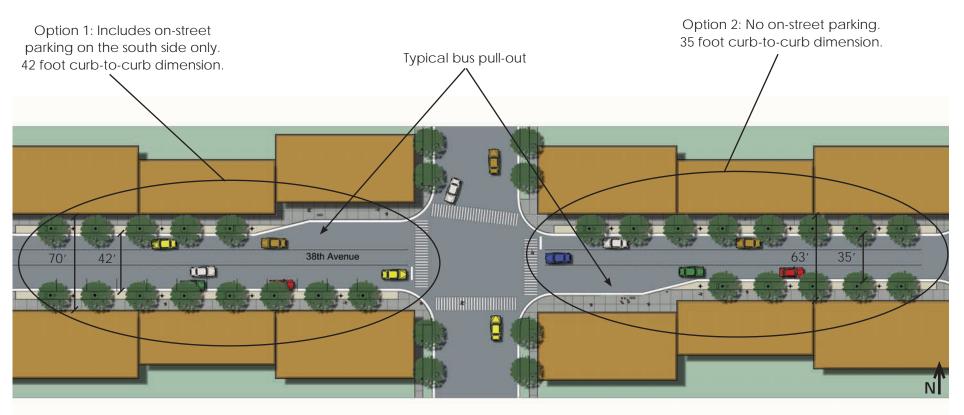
Option 2 for Permanent Main Street Road Diet. The curbs are relocated in order to create a 3-lane section with no on-street parking. In this option, there is a 35-foot wide roadway and room to fit the full 8-foot sidewalk and 6-foot amenity zone within the existing 60foot right-of-way that is typical for the street. It would be possible to fit the full sidewalk and amenity zone within 63 feet of right-of-way.
